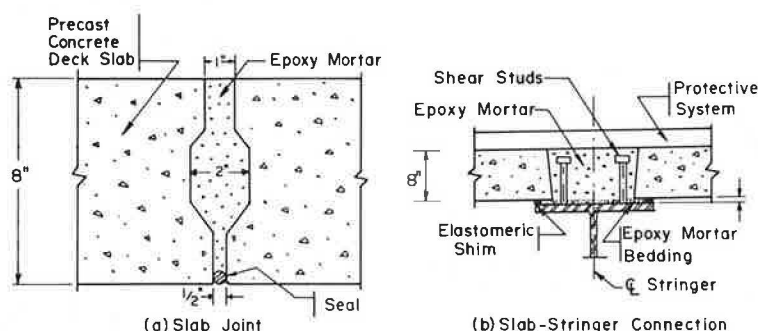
Typical application of epoxy mortar in modular bridge deck construction.
